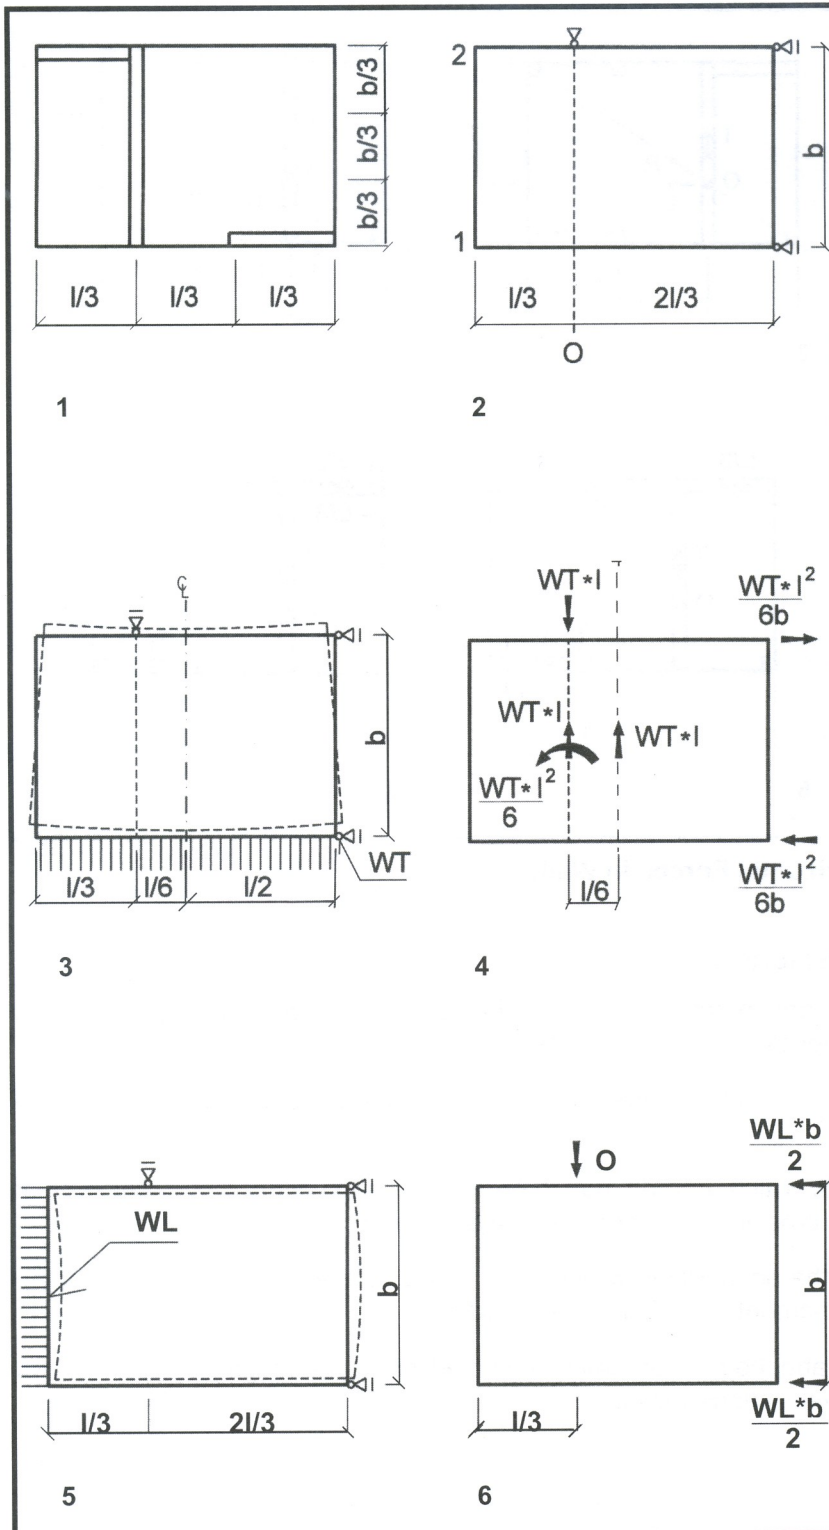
Statical Model Of Wall System For The Transfer Of Wind Load
